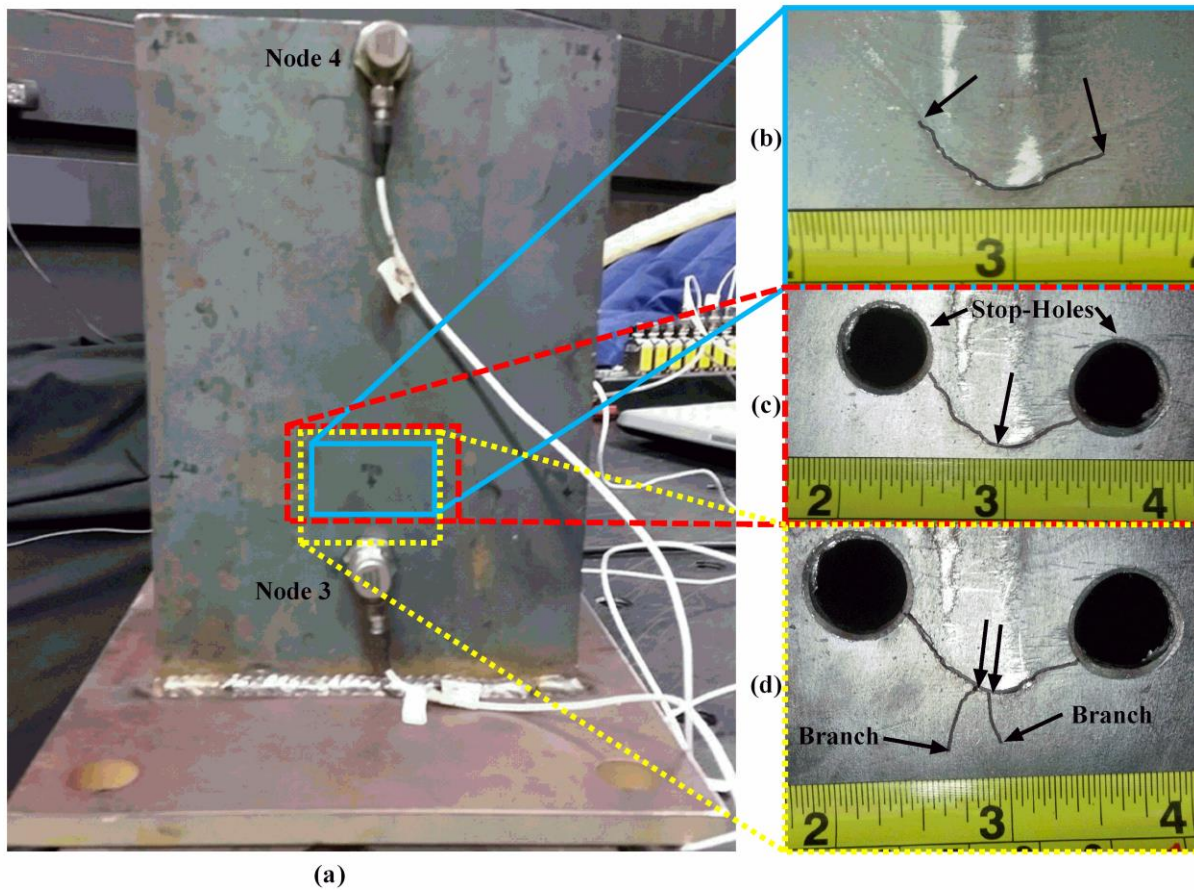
Damage caused in Specimen 1 - Side B: (a) overall side view indicating locations of damage, (b) 25 mm crack (D1), (c) 25 mm crack with 12.7 mm diameter holes drilled at crack tips (D1H), (d) 25 mm crack with 12.7 mm diameter holes drilled at crack tips and two cracks approximately 13 mm long branching from the middle of the existing 25 mm crack
